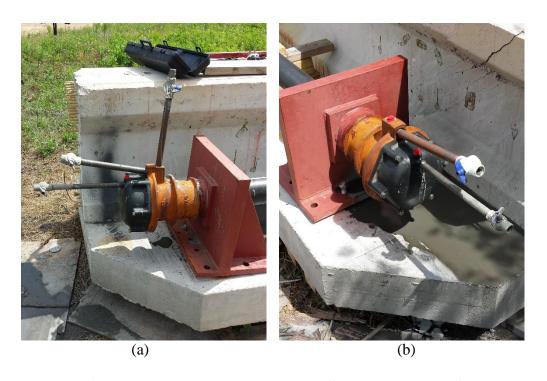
Grout Ports at Anchorage: (a) Non-Stressing End, (b) Stressing End
